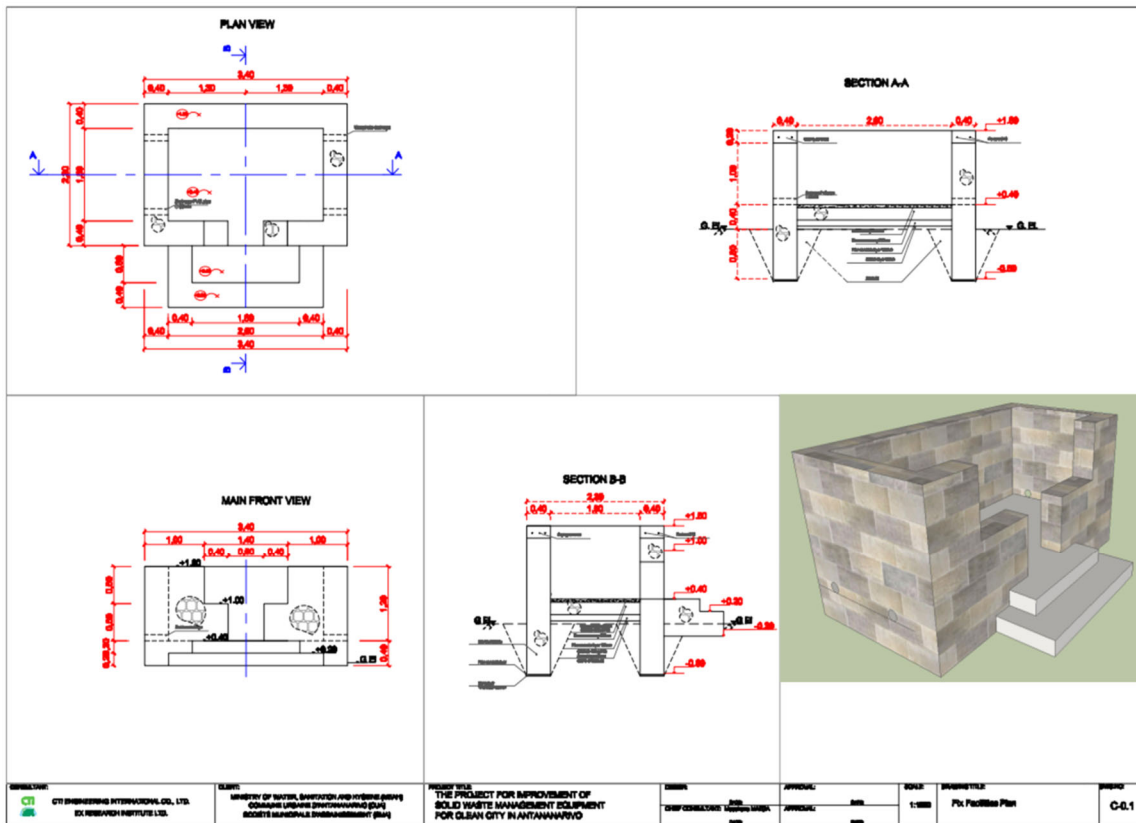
Three-view Drawings of a Fixed Masonry Type Facility for Renovation Work
